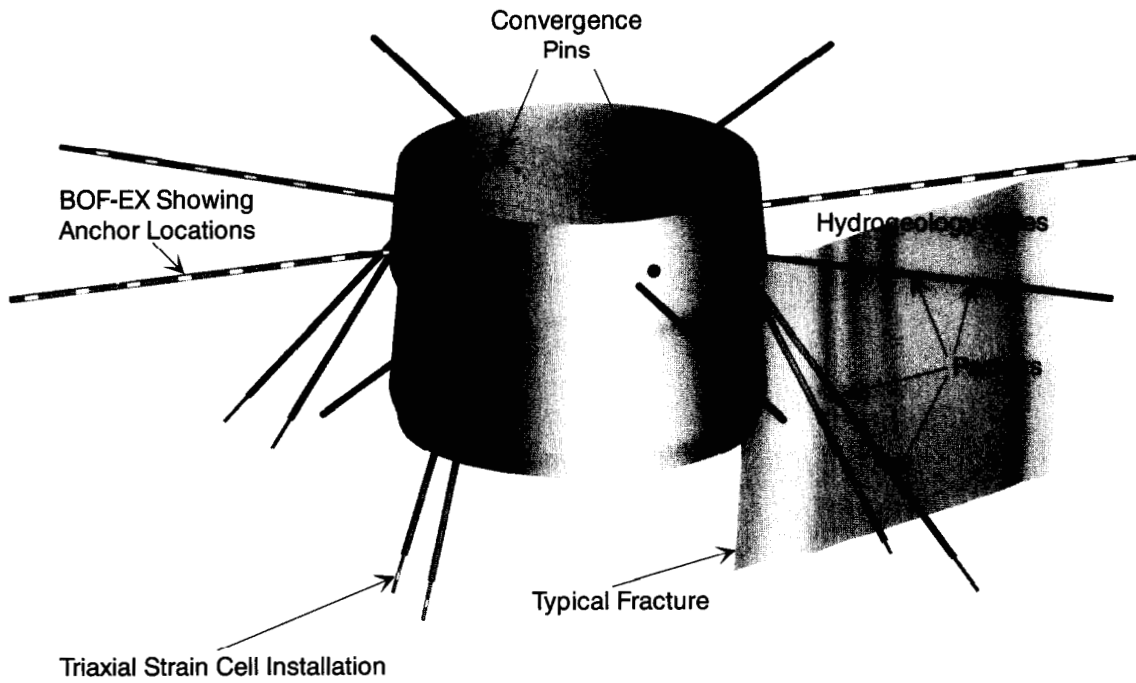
Typical Instrument Array Layout in the Underground Research Laboratory Shafts
